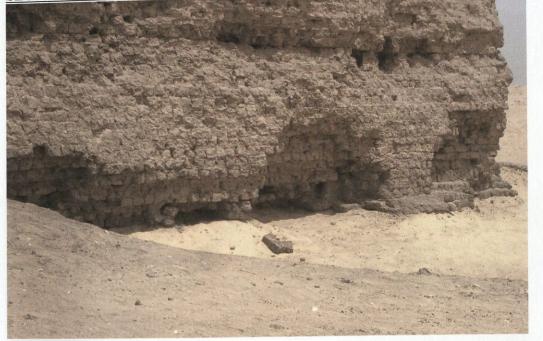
Another example of a wall base that will have to be stabilized. This large section of wall is at the southwest corner of the enclosure wall.
